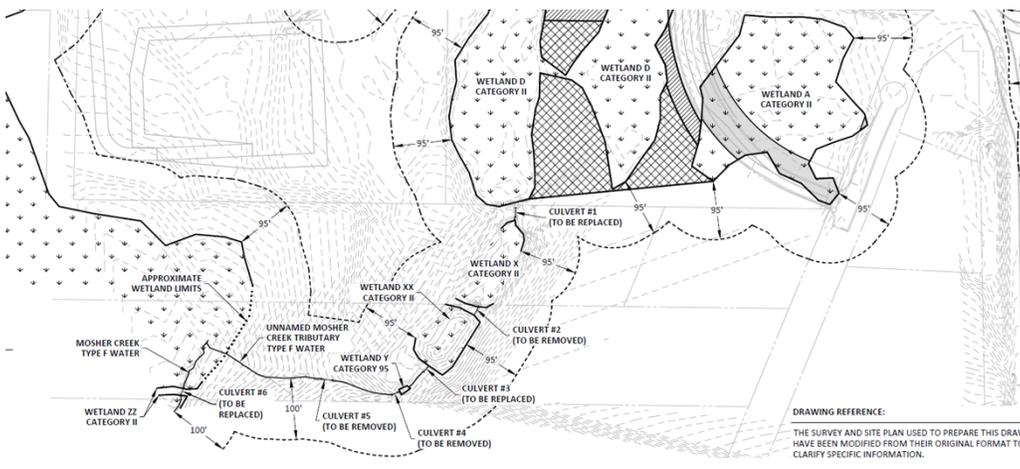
Enlargement of Mitigation Plan to Show Off-Site Stream Culvert Replacement
